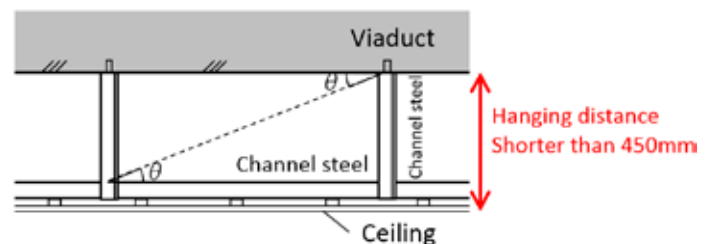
Seismic reinforcement with channel steel (Existing construction method for short-hanging-distance ceilings)
